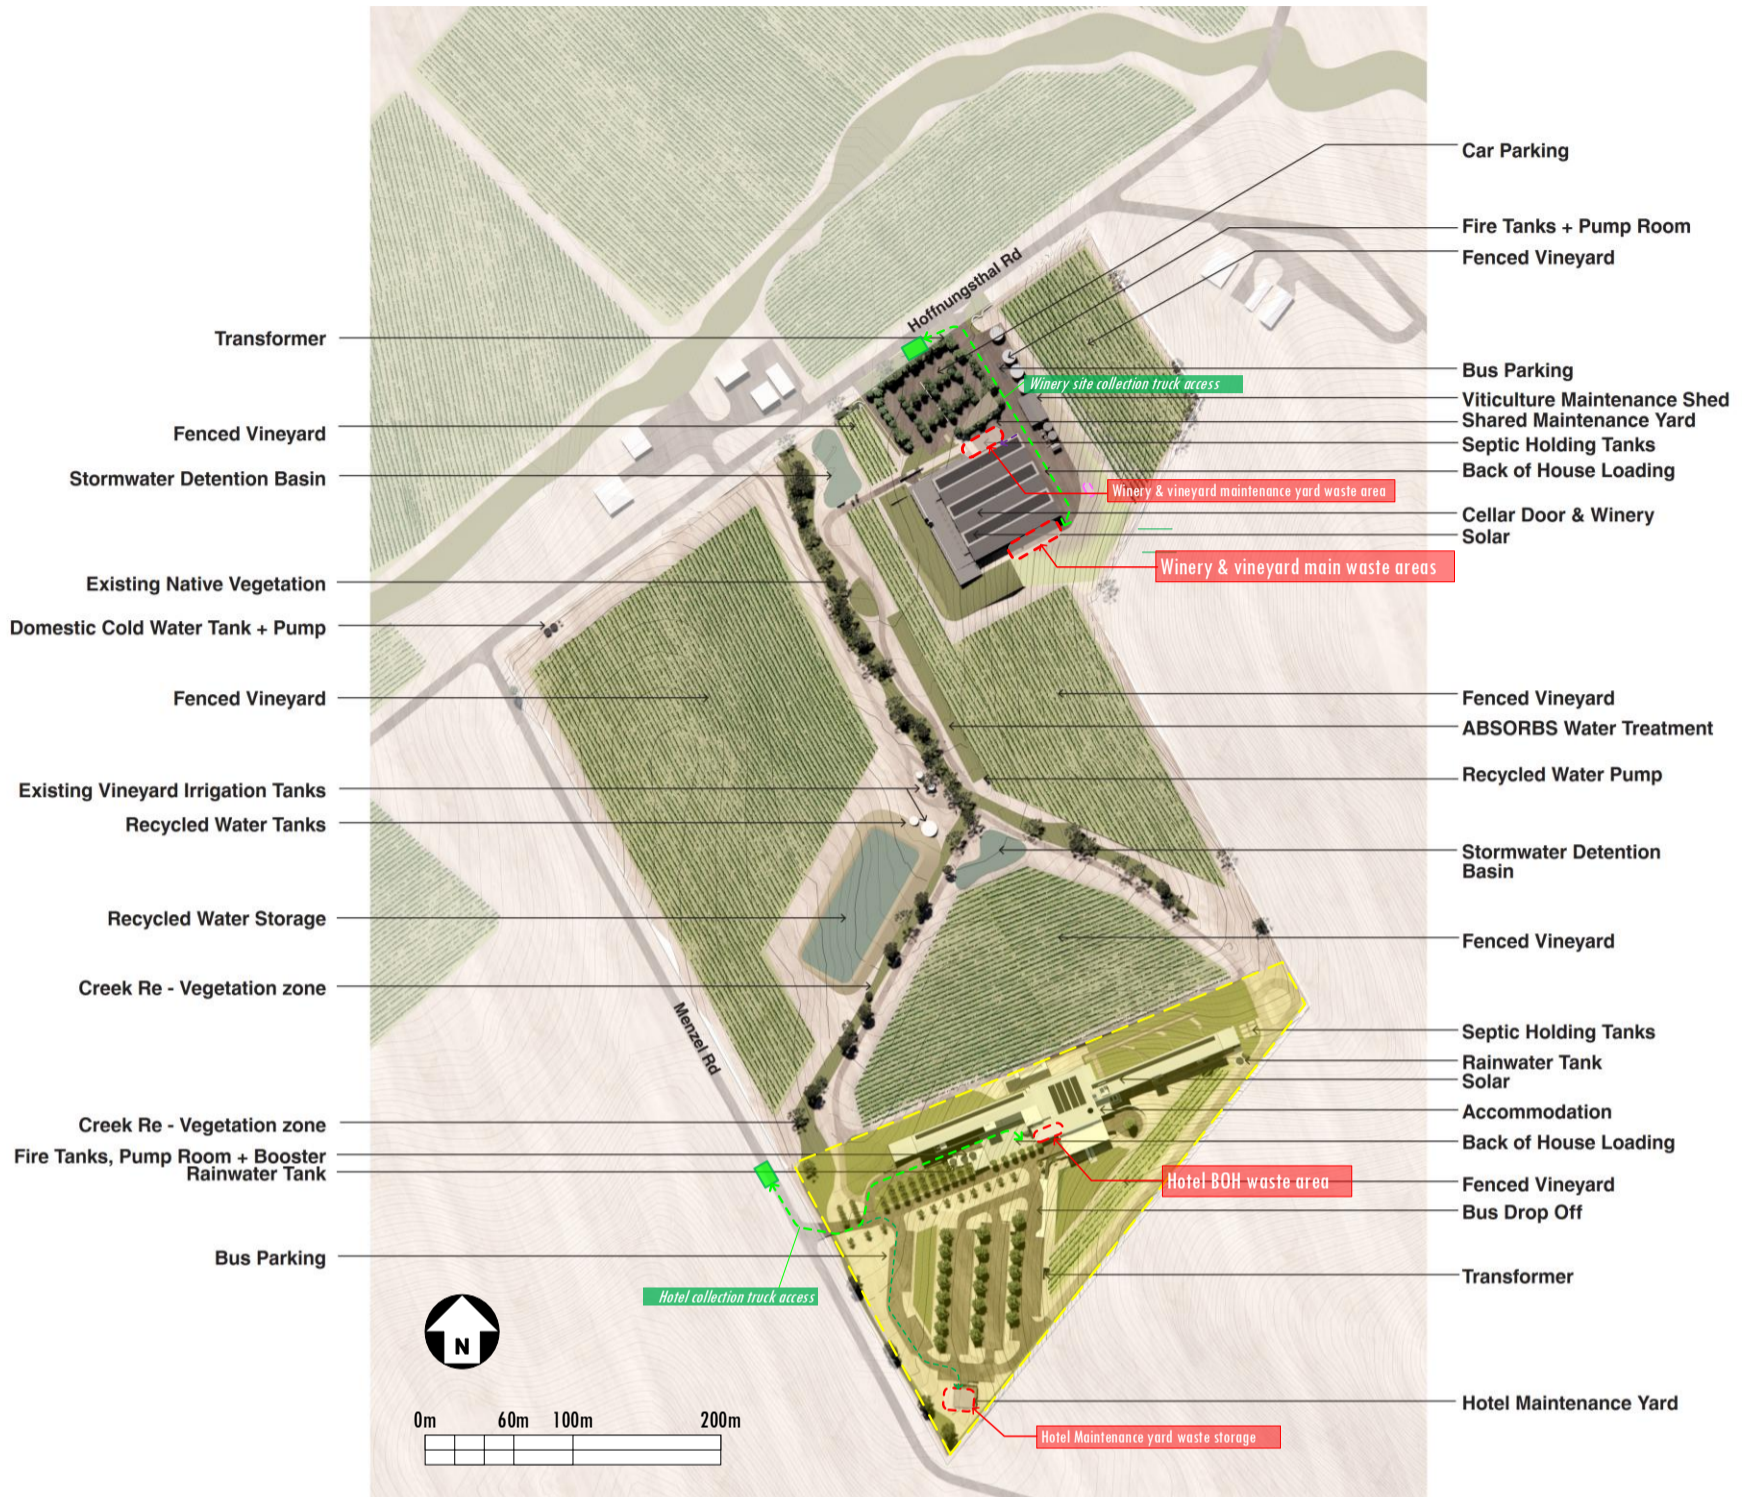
Development site showing location of Hotel site (highlighted in yellow) and its key waste management areas. Site context plan reproduced from project concept plans by Project Architect (baukultur, 8 August 2025).
